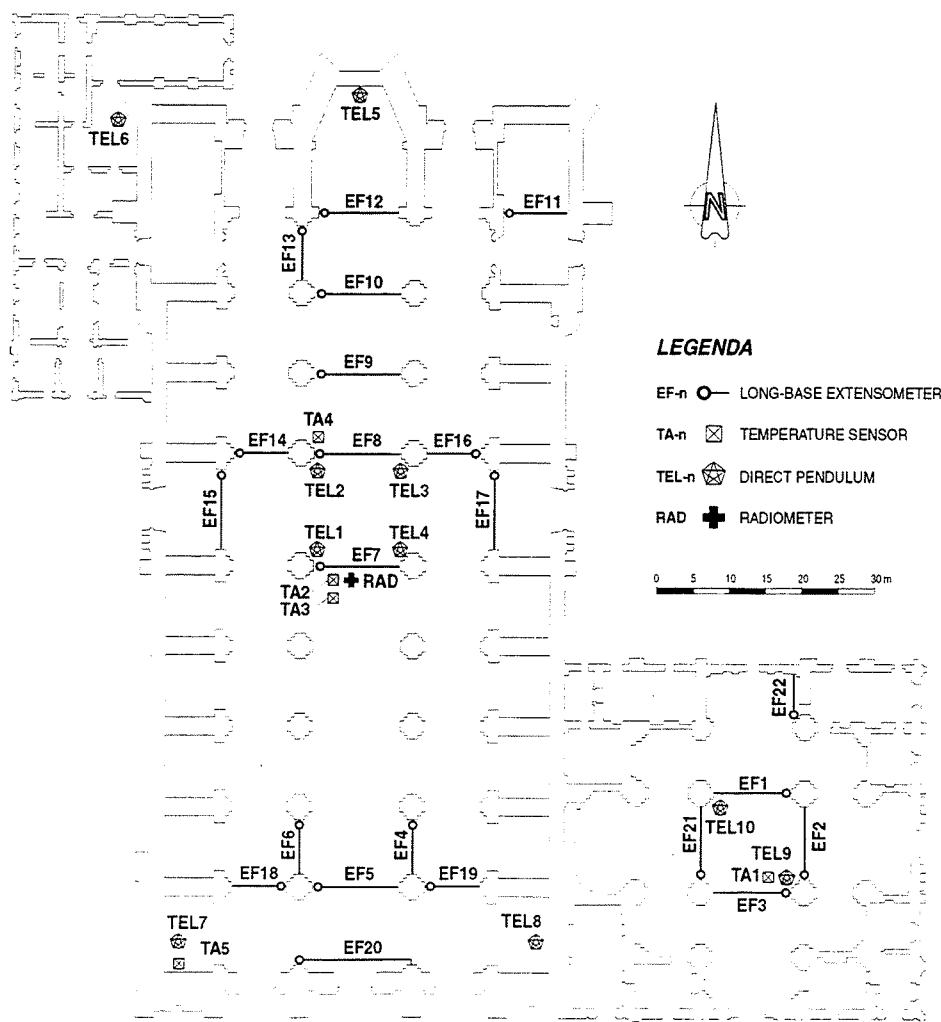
General lay-out of the instruments connected to the automatic monitoring system.
